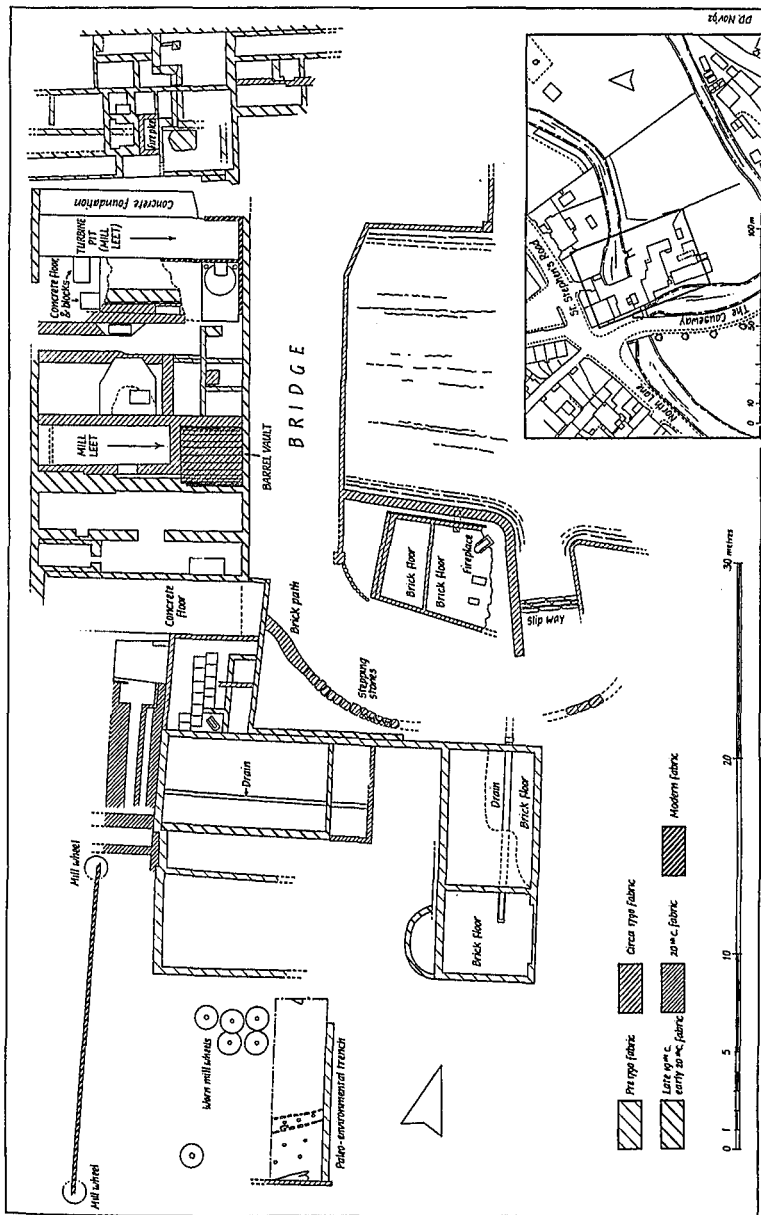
Location plan and tentative phase plan of excavated foundations at Dean's Mill.
